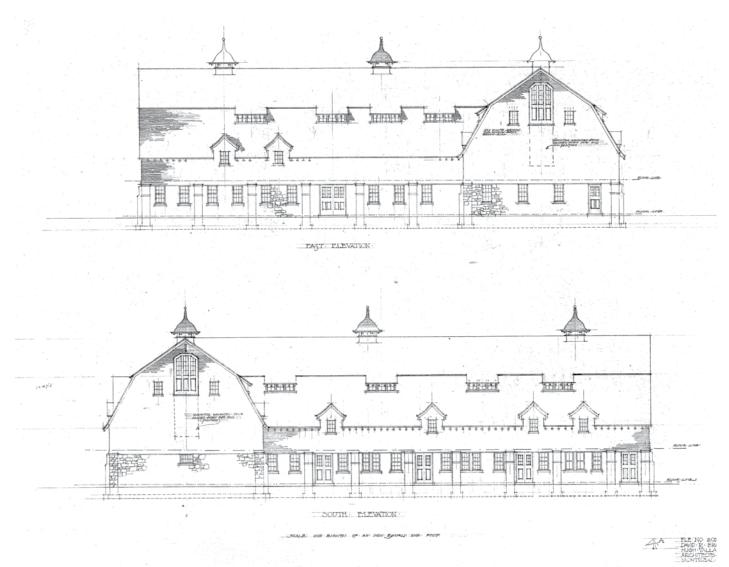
South and East elevations of the Stone Barn, by Brown and Vallance Architects. Here the lower walls are rendered as they were built, in stone. Note that the barn was not built exactly as shown. Retrieved from Facilities Management Division Asset Record System, File B-7-T.
